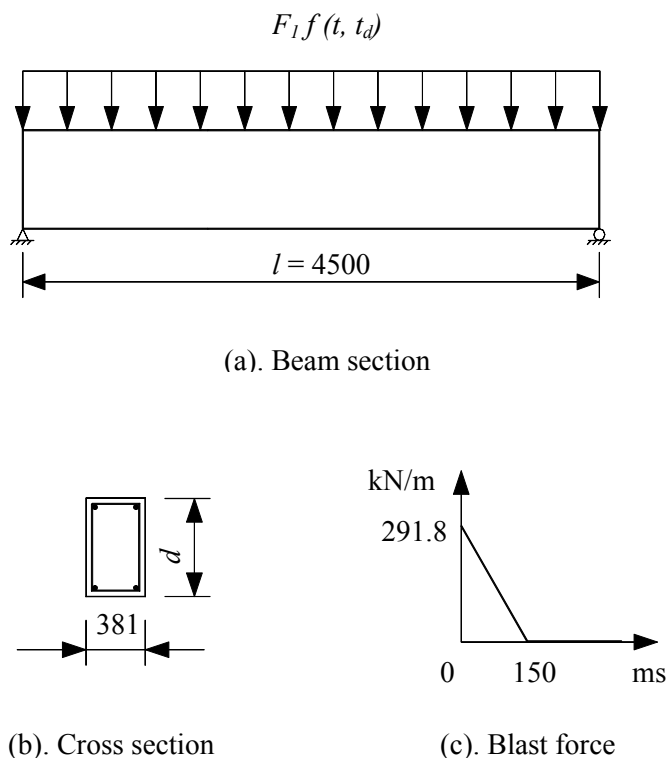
Sketch of a simply supported beam in design example III (unit: mm)
